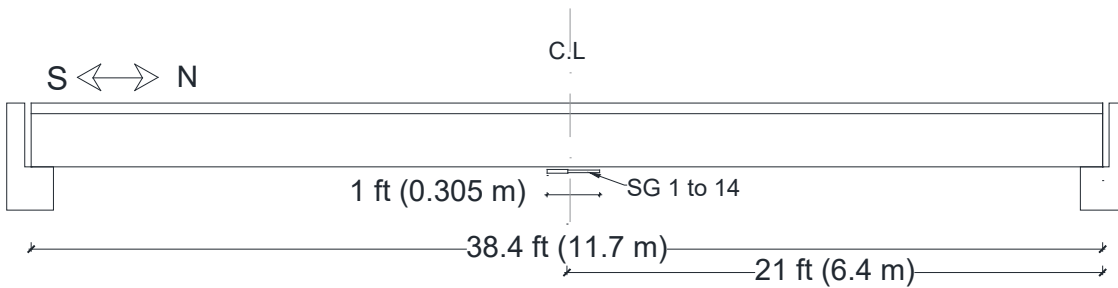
Girder Strain Gauge Instrumentation Plan for Flexural Response of 30-in. (762-mm) Deep Double-Tee Girder Bridge – Elevation View
